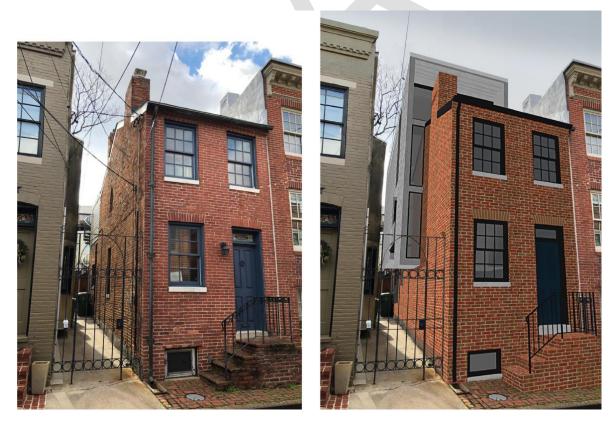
223 E. Churchill Street – Existing Conditions (left) and Proposed Rendering (right)
